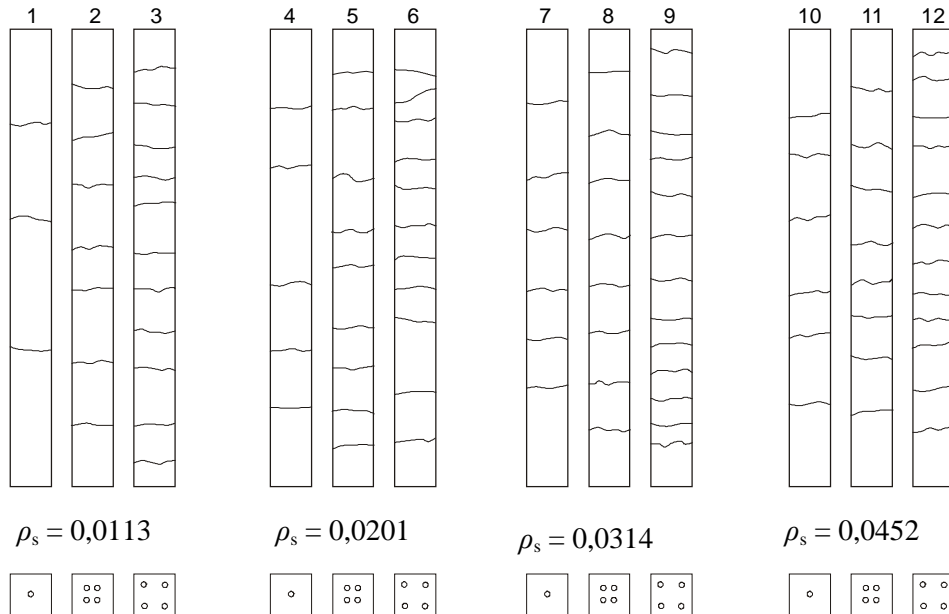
Reinforced concrete tensile members subjected to axial tension (Stevin laboratory, TU Delft, 1976)
